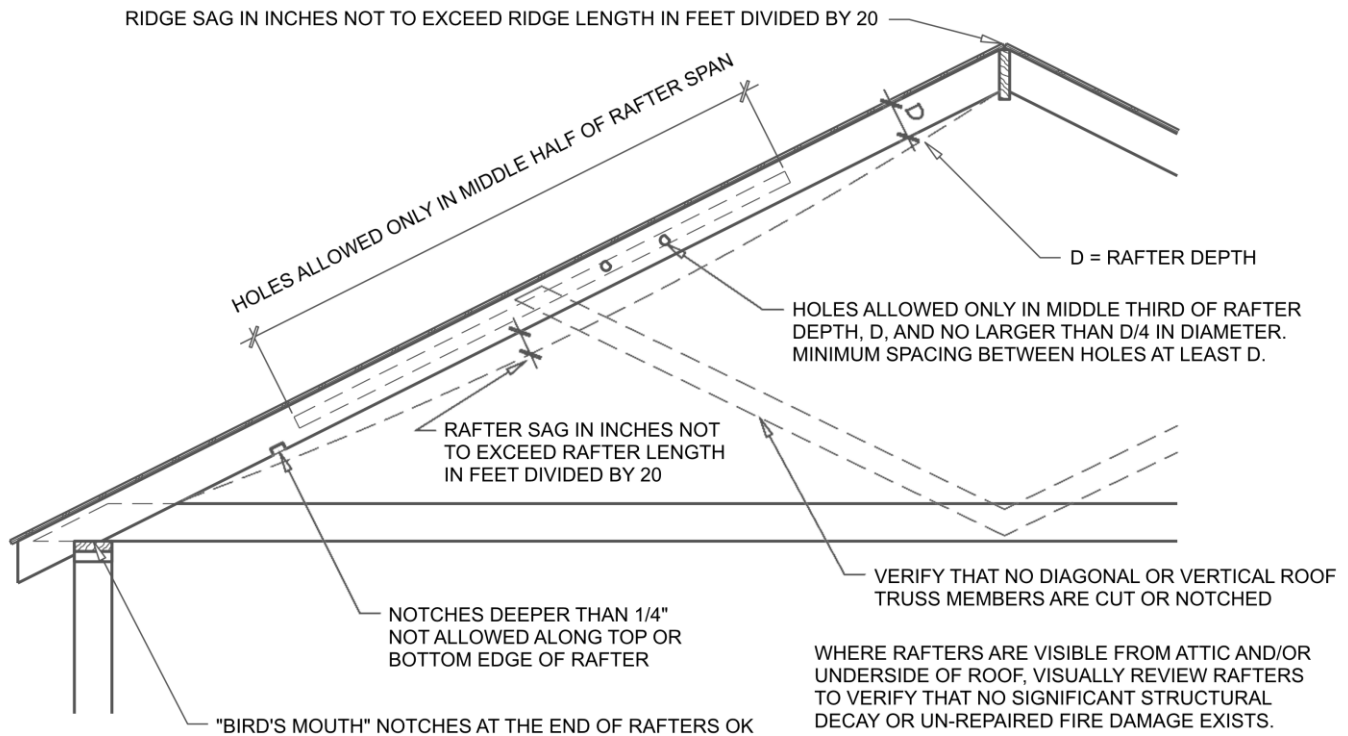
ROOF VISUAL STRUCTURAL REVIEW OF EXISTING CONDITIONS
